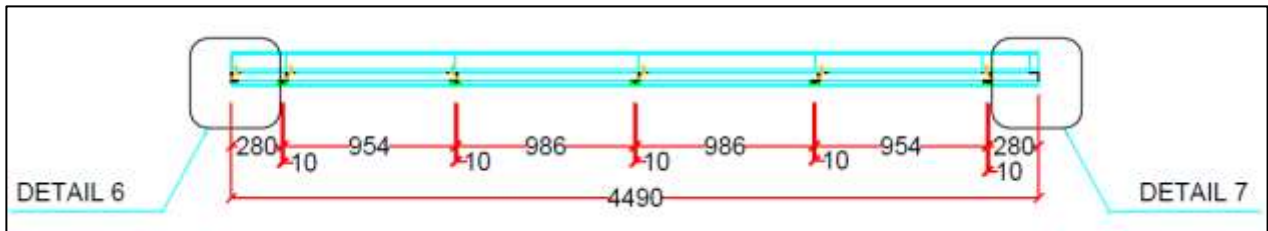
Elevation view of the ACPs fixed onto the runners.
